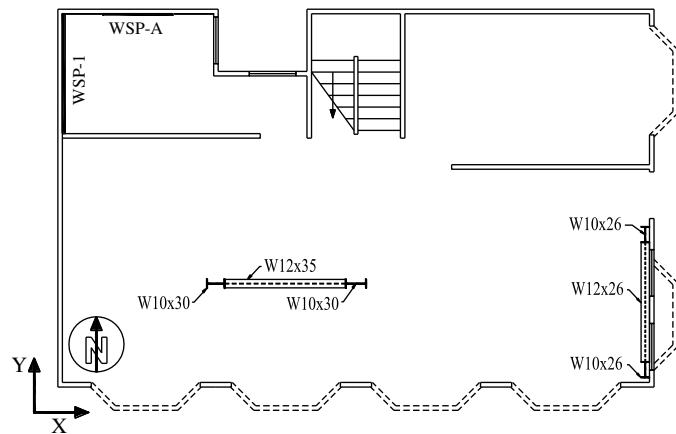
Location of steel special moment frames and wood structural panels in the ground story
